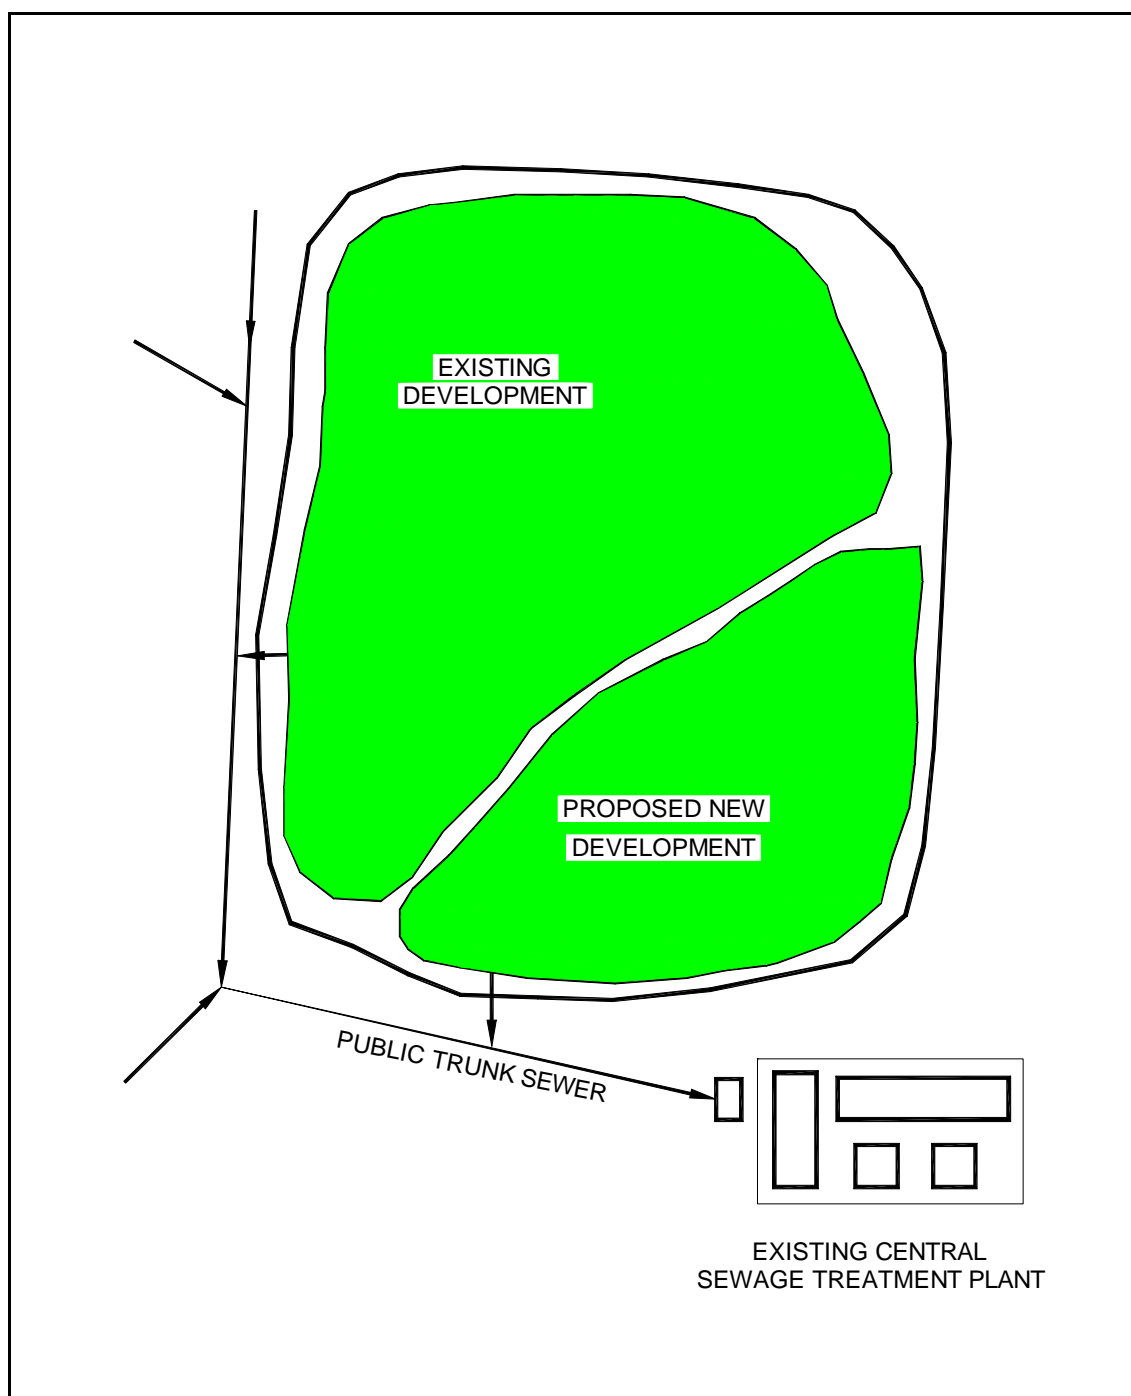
Link to Existing Public Sewer and Central Sewage Treatment Plant
